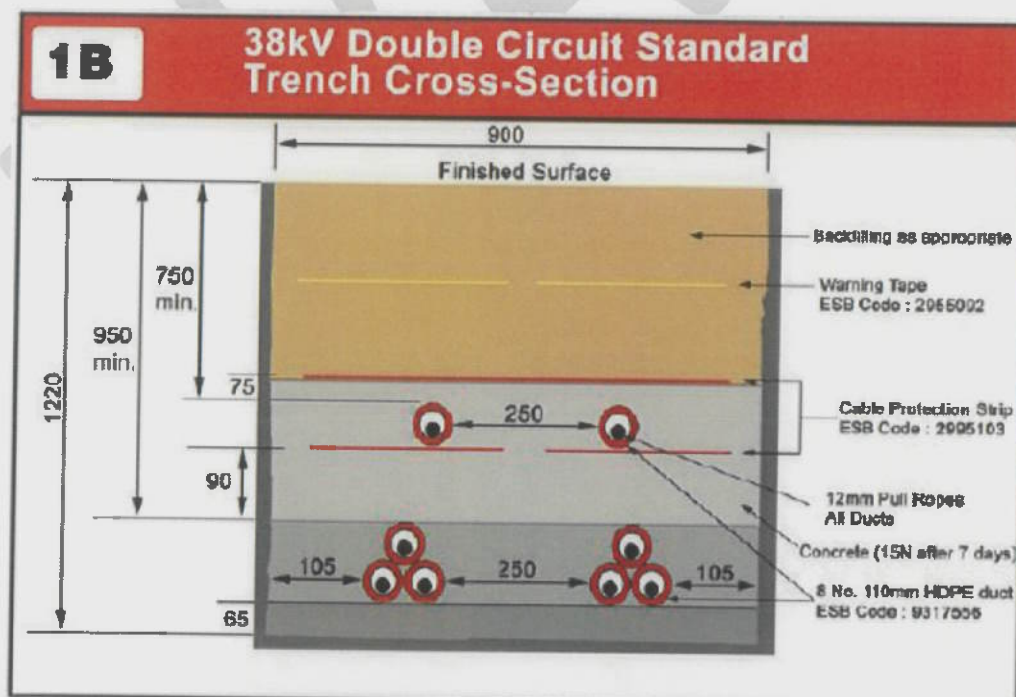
Example of ESB 38V Twin Circuit Cross Section which will likely run through Site 4 roadway (Waterman Moylan on behalf of LDA).
